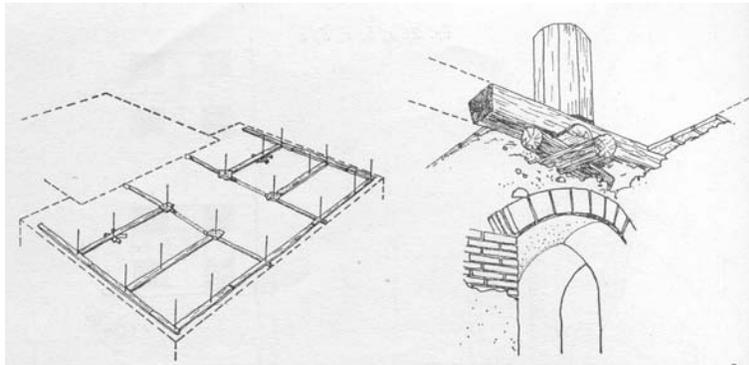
Detail of wooden beams to hold pillar weight in weak points
